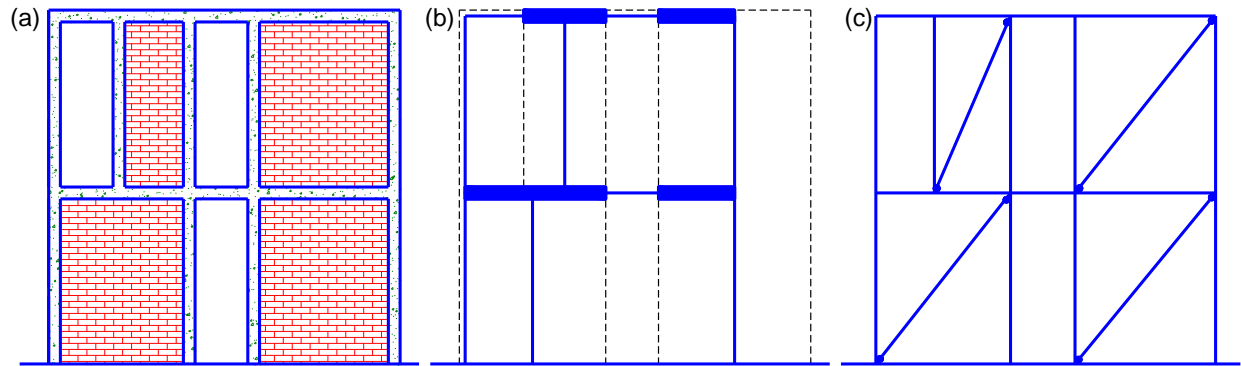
(a) Example of confined masonry wall with openings, (b) wide-column model, and (c) equivalent strut model.
